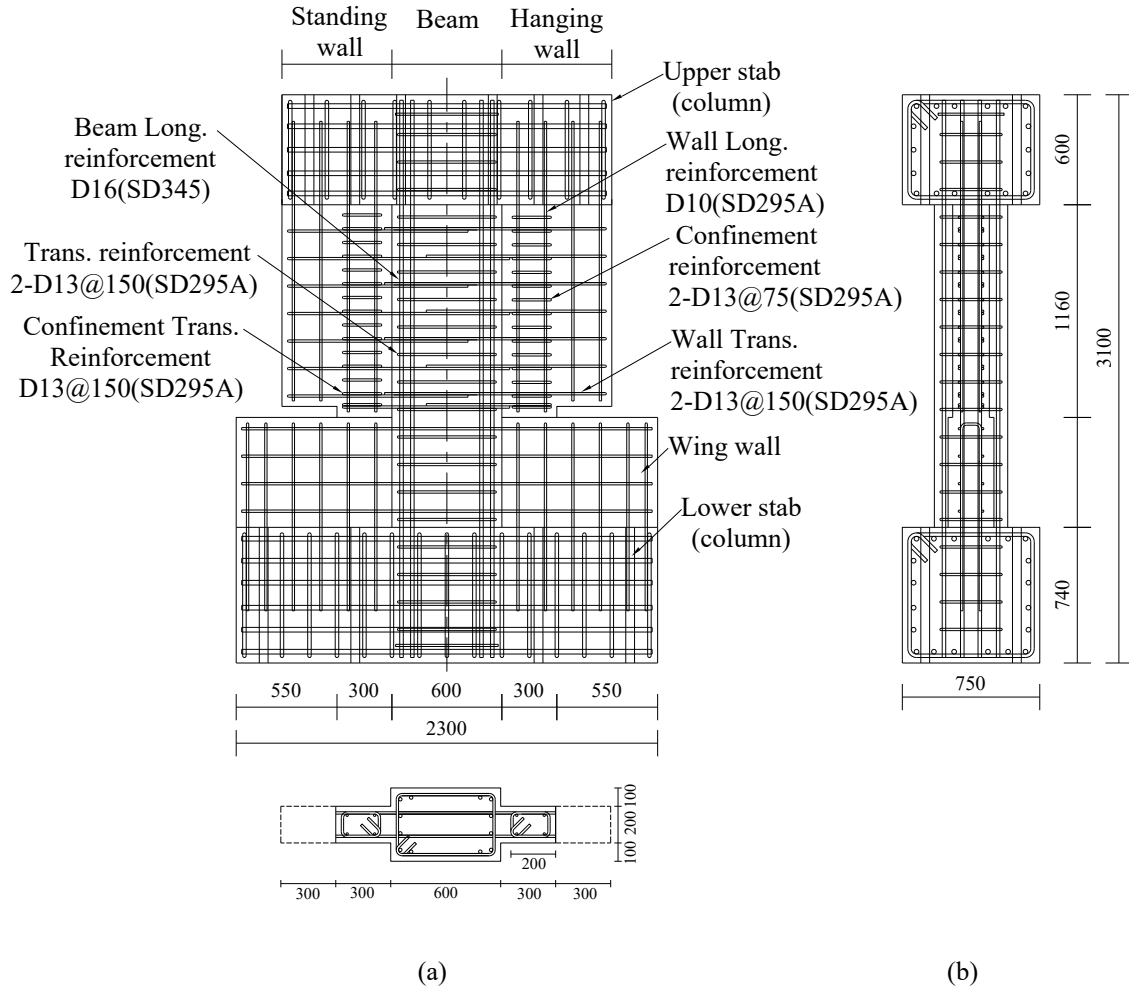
Geometry of specimen BSH; (a) in-plane view; (b) out-plane view of
